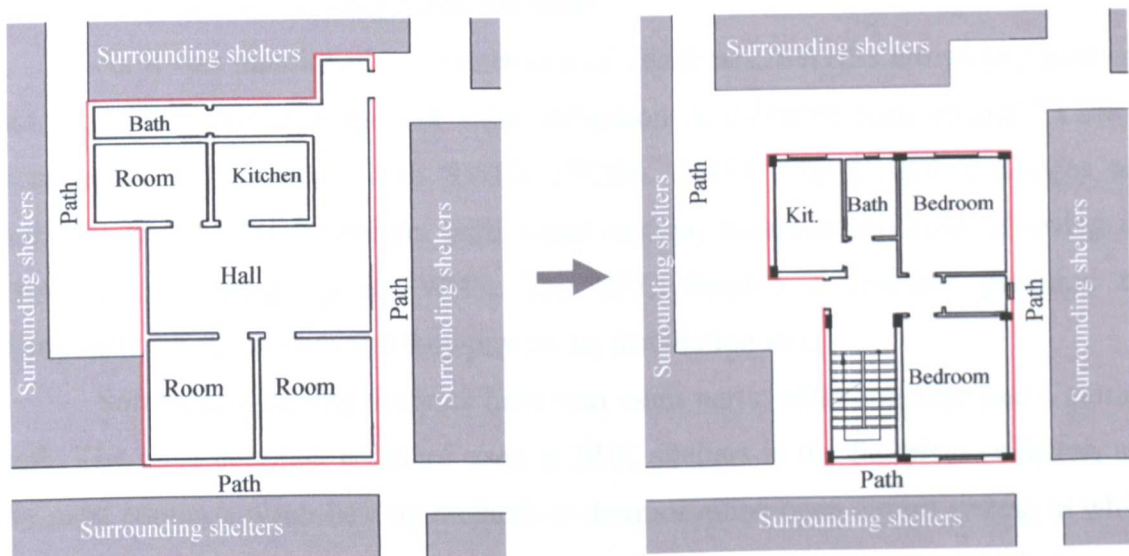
Site layout of a SHC shelter before and after reconstruction, survey 2009
